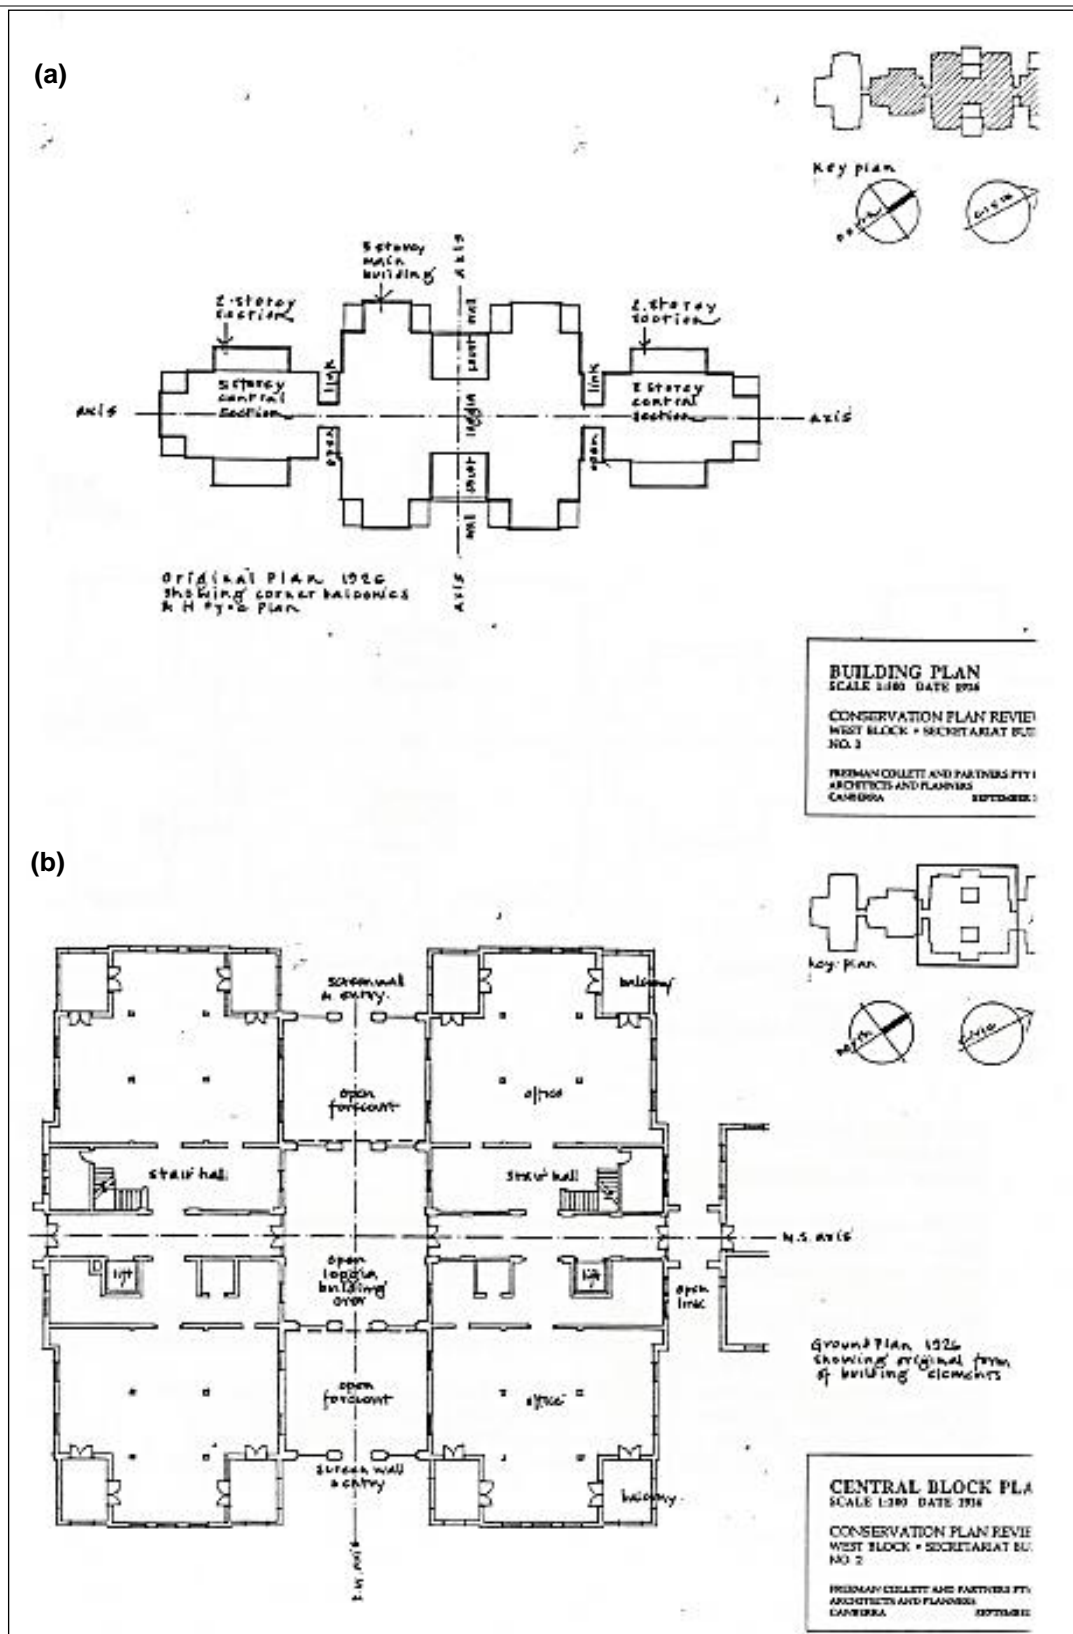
1926 Plans: (a) Building Plan; (b) Central Block Plan
